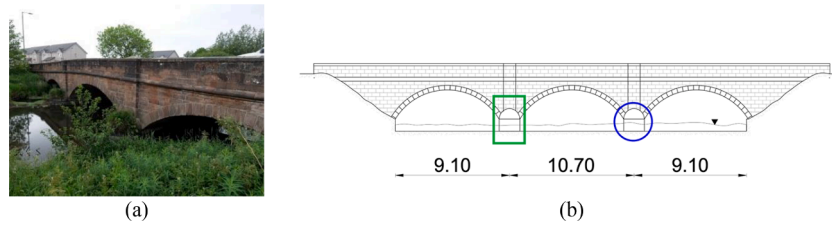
(a) A76 200 Nith Bridge; and (b) bridge elevation.
